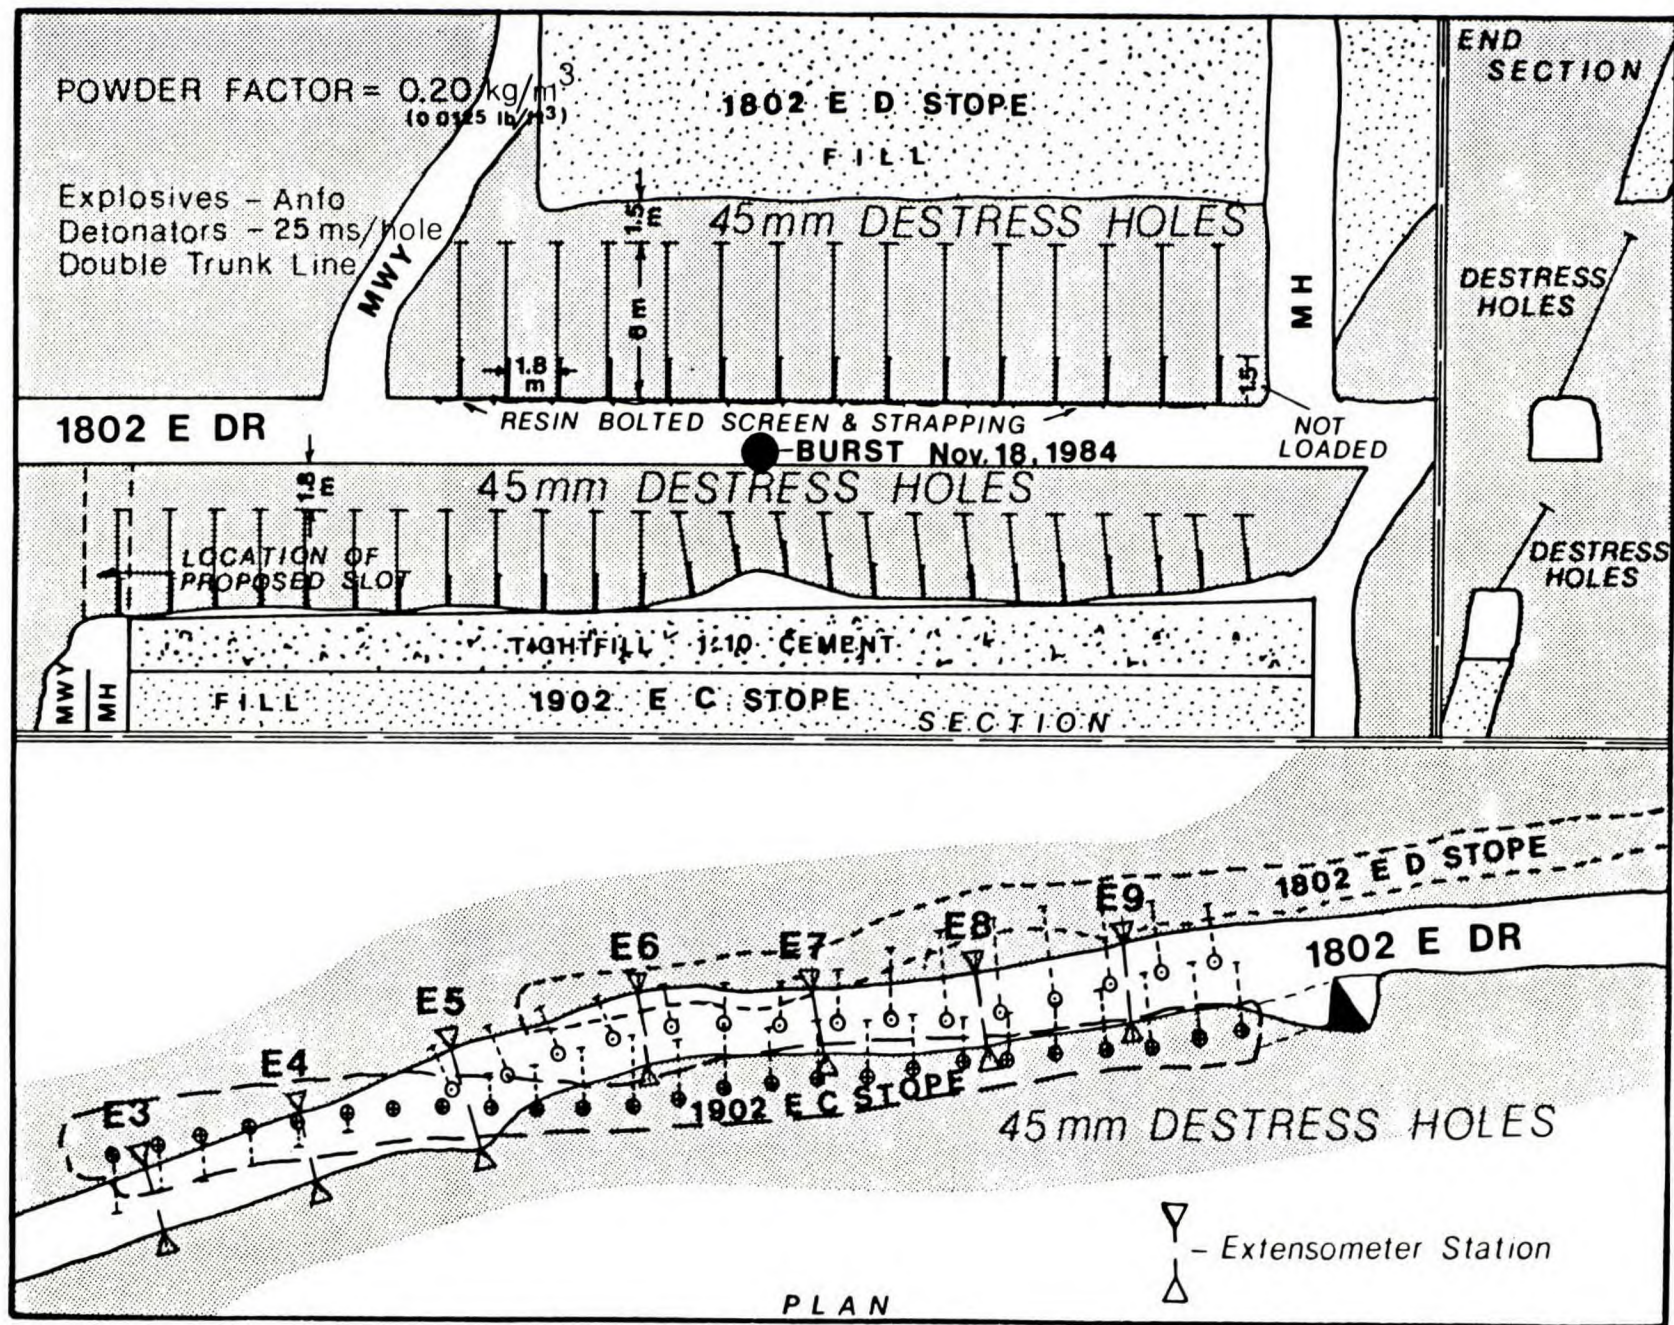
Layout of destress holes in the 1902 and 1802 crown and sill pillars at the Campbell Mine.
